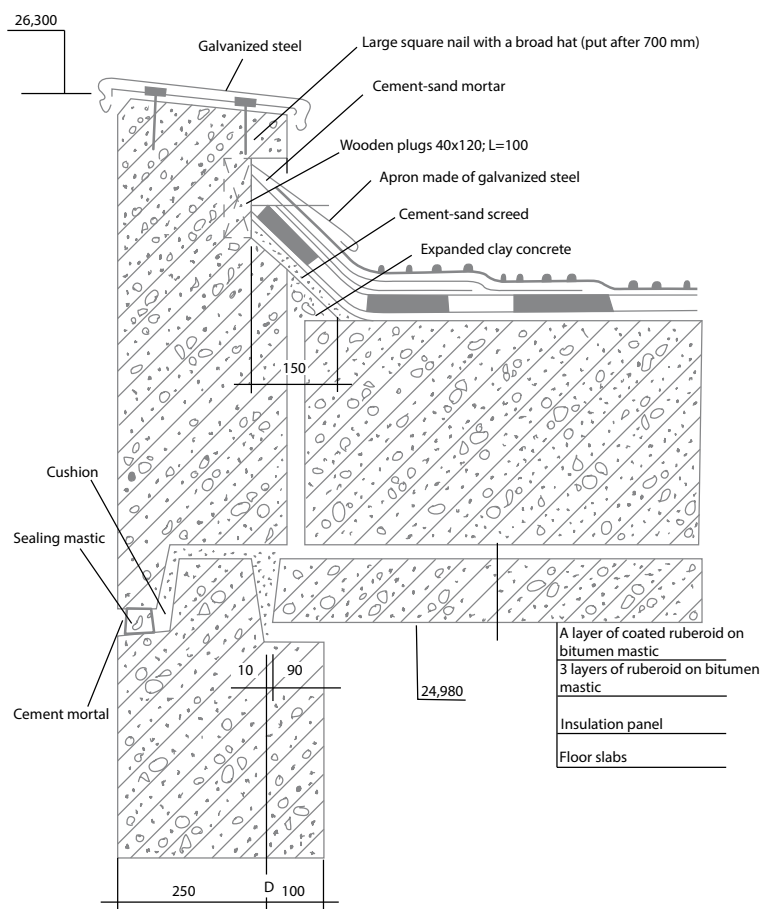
The construction of the combined covering of a large panel house (conjoined with the external wall).
